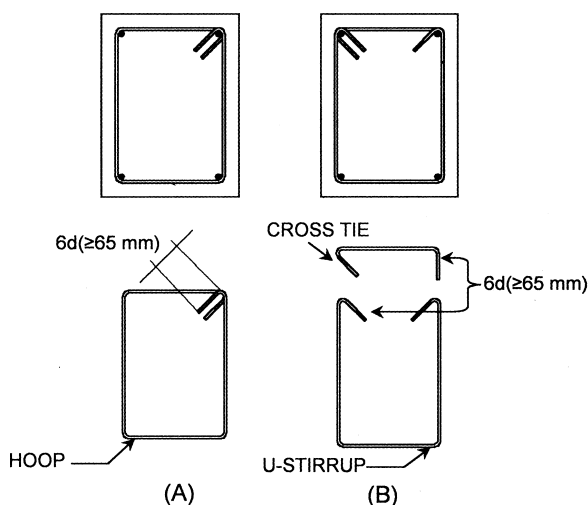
DETAILS OF TRANSVERSE REINFORCEMENT IN BEAMS
